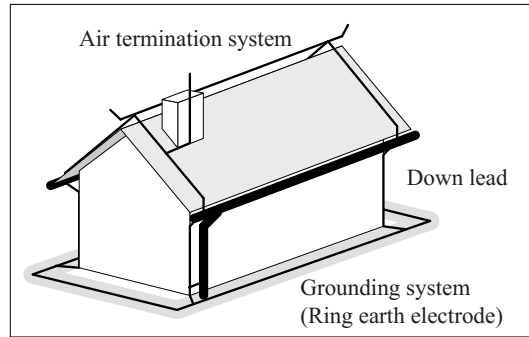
Meshed construction of an external lightning protection system for a building including roof gutters and down pipes (schematic example).
